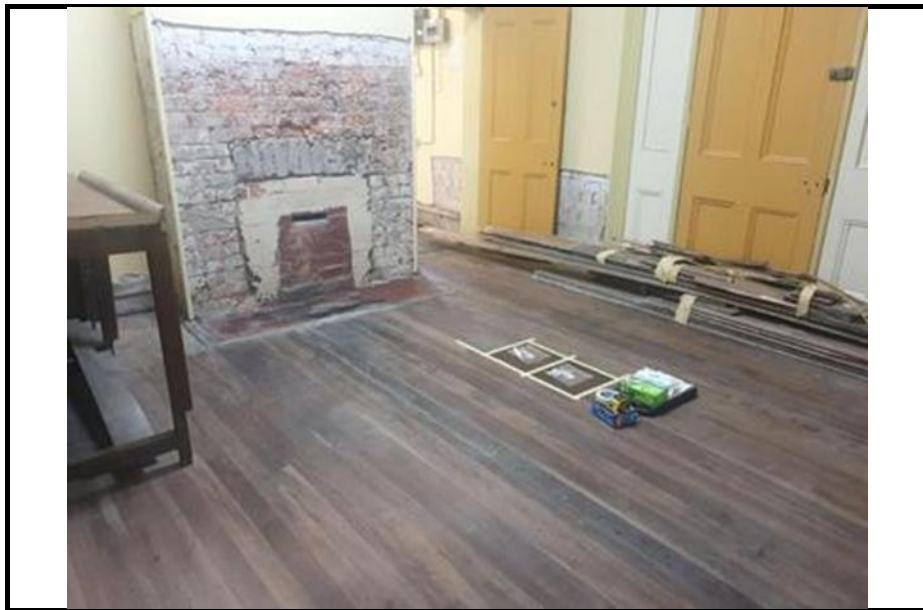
Floor dust swab sampling at location DSWAB_VALB(TS) with duplicate sample DSWAB_DUP2.
